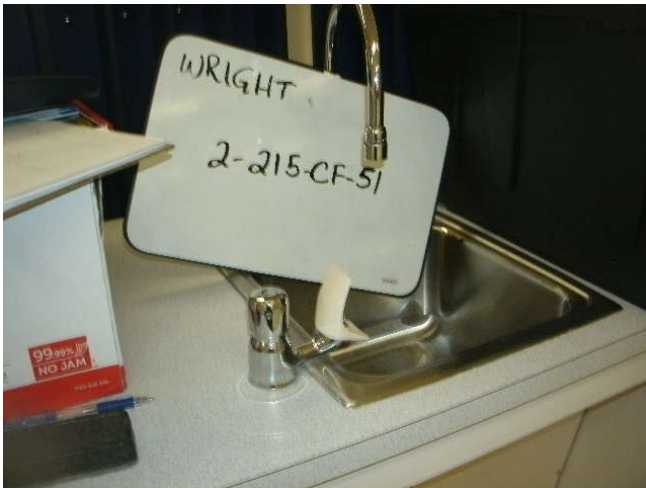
Classroom faucet w/bubbler, located on the 2nd floor, in room 215.
